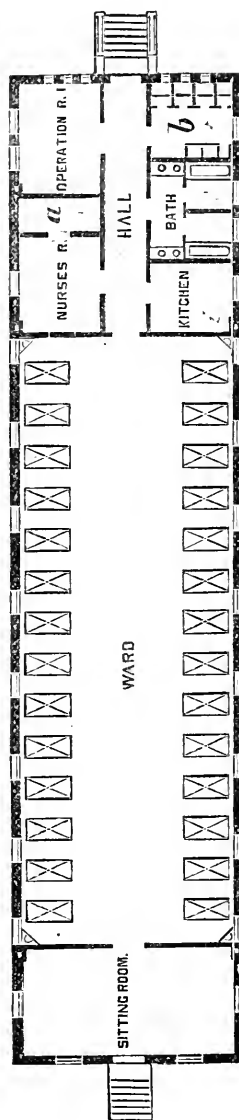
gives the plan of the one-story pavilion of the *Presbyterian Hospital*, of Philadelphia. This building was completed in 1875, and illustrates very well about the best of the one-story pavilions that have been erected.
